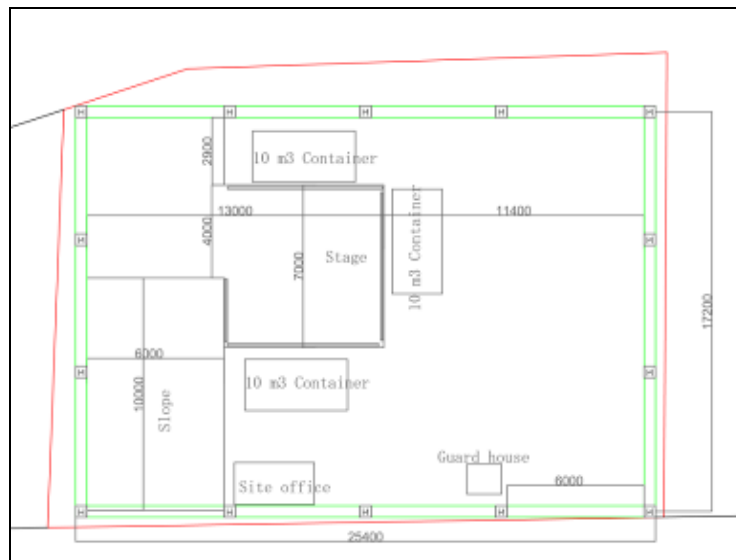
Tentative Layout Plan of Mughal Chowk Transfer Station (Not to Scale)
